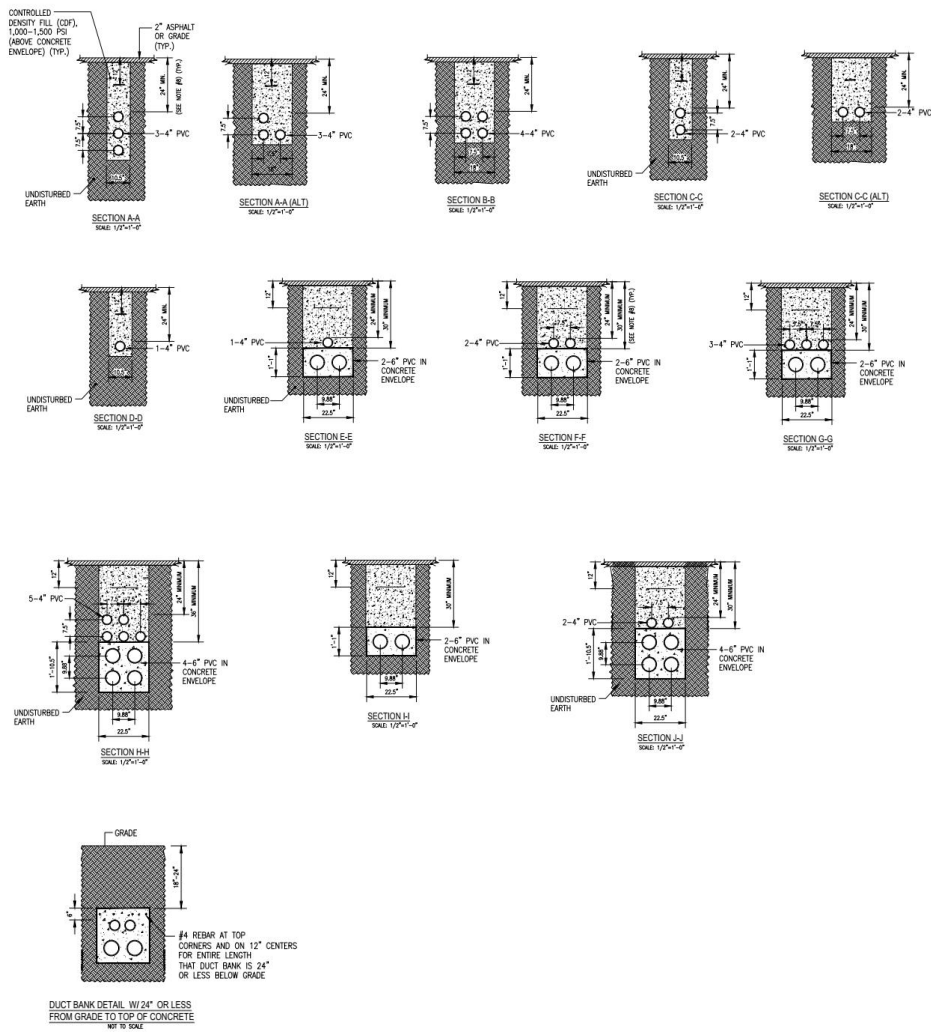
The duct banks that will be installed along the proposed 9A Underground Electrical project route and roadway repair details.
